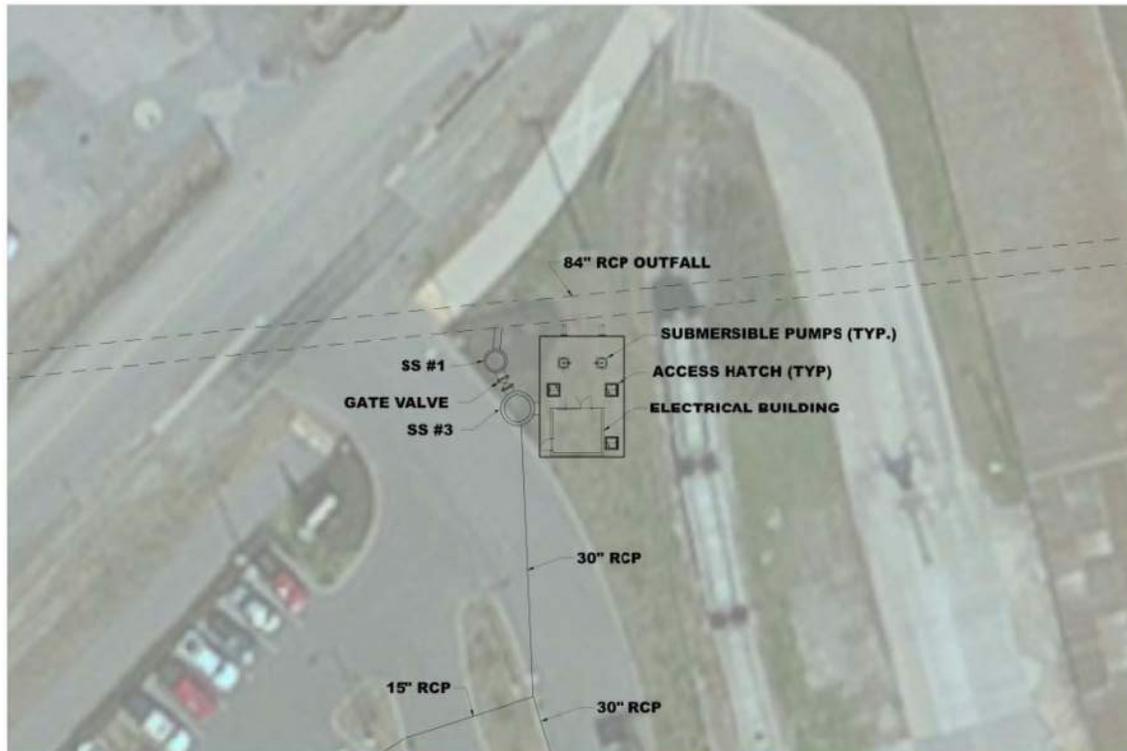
Proposed Biosolids Stormwater Piping Modifications and PS
